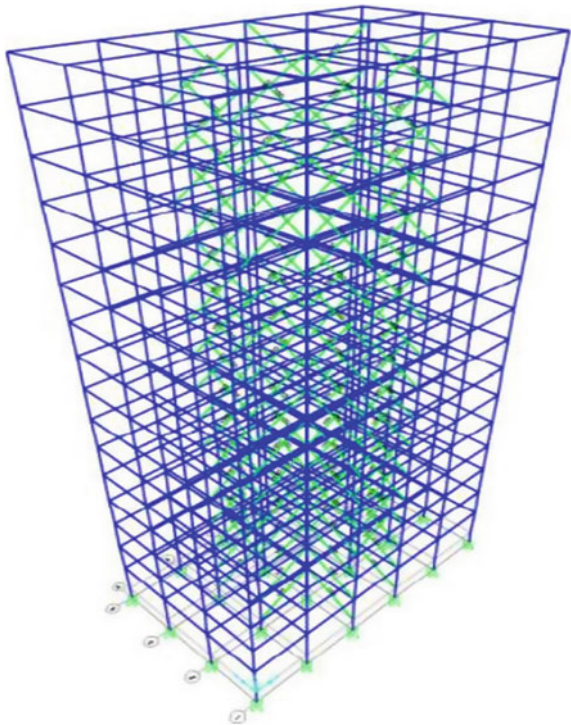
3D view of G+15 storey bare frame building with viscoelastic damper at 1st and 2nd position
